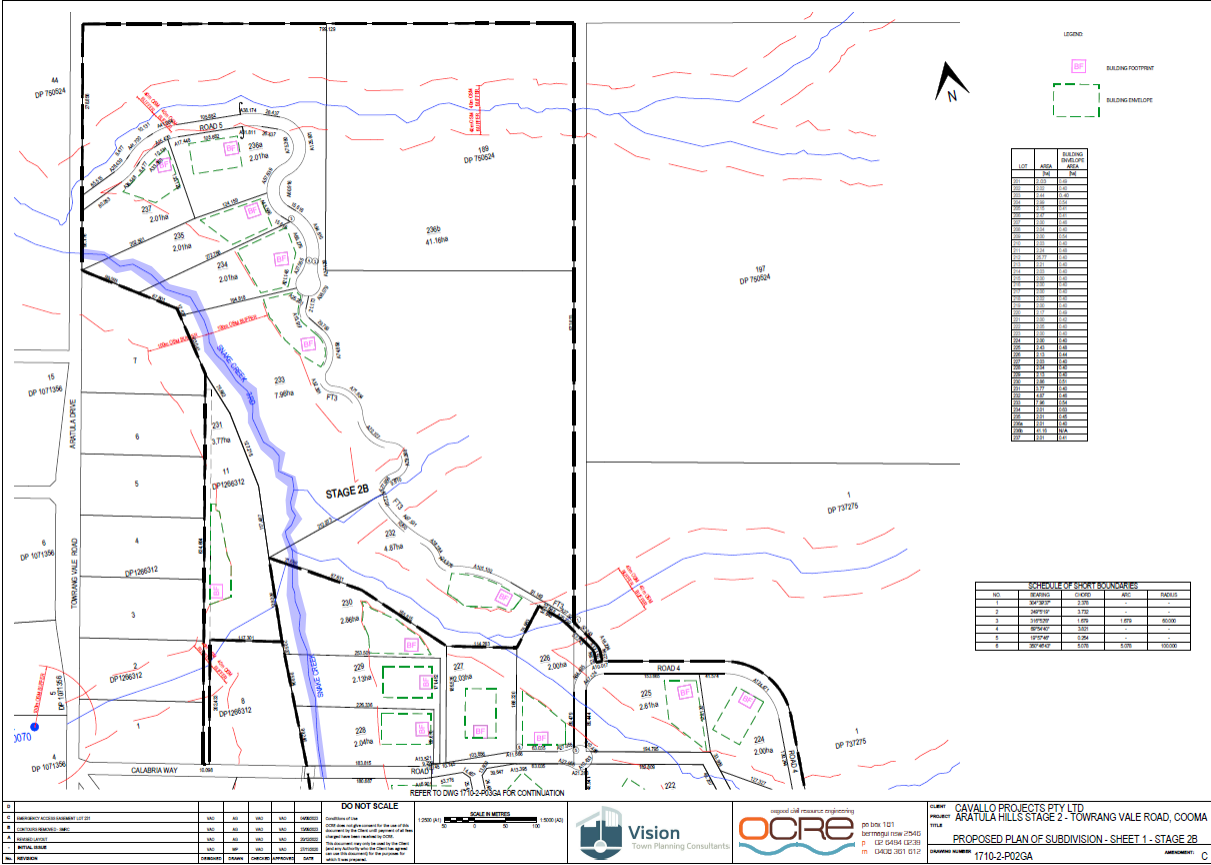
Building footprint (BF) and building envelopes (outlined in green) within each proposed lot. Snake Creek Conservation Area shaded blue.
